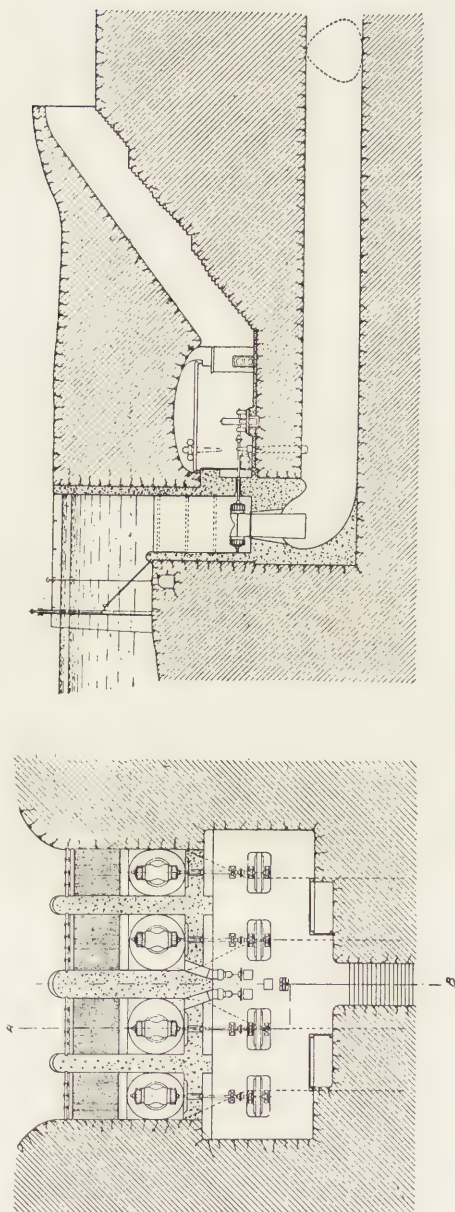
Plan and Section of Mockfjärd Power Plant.
